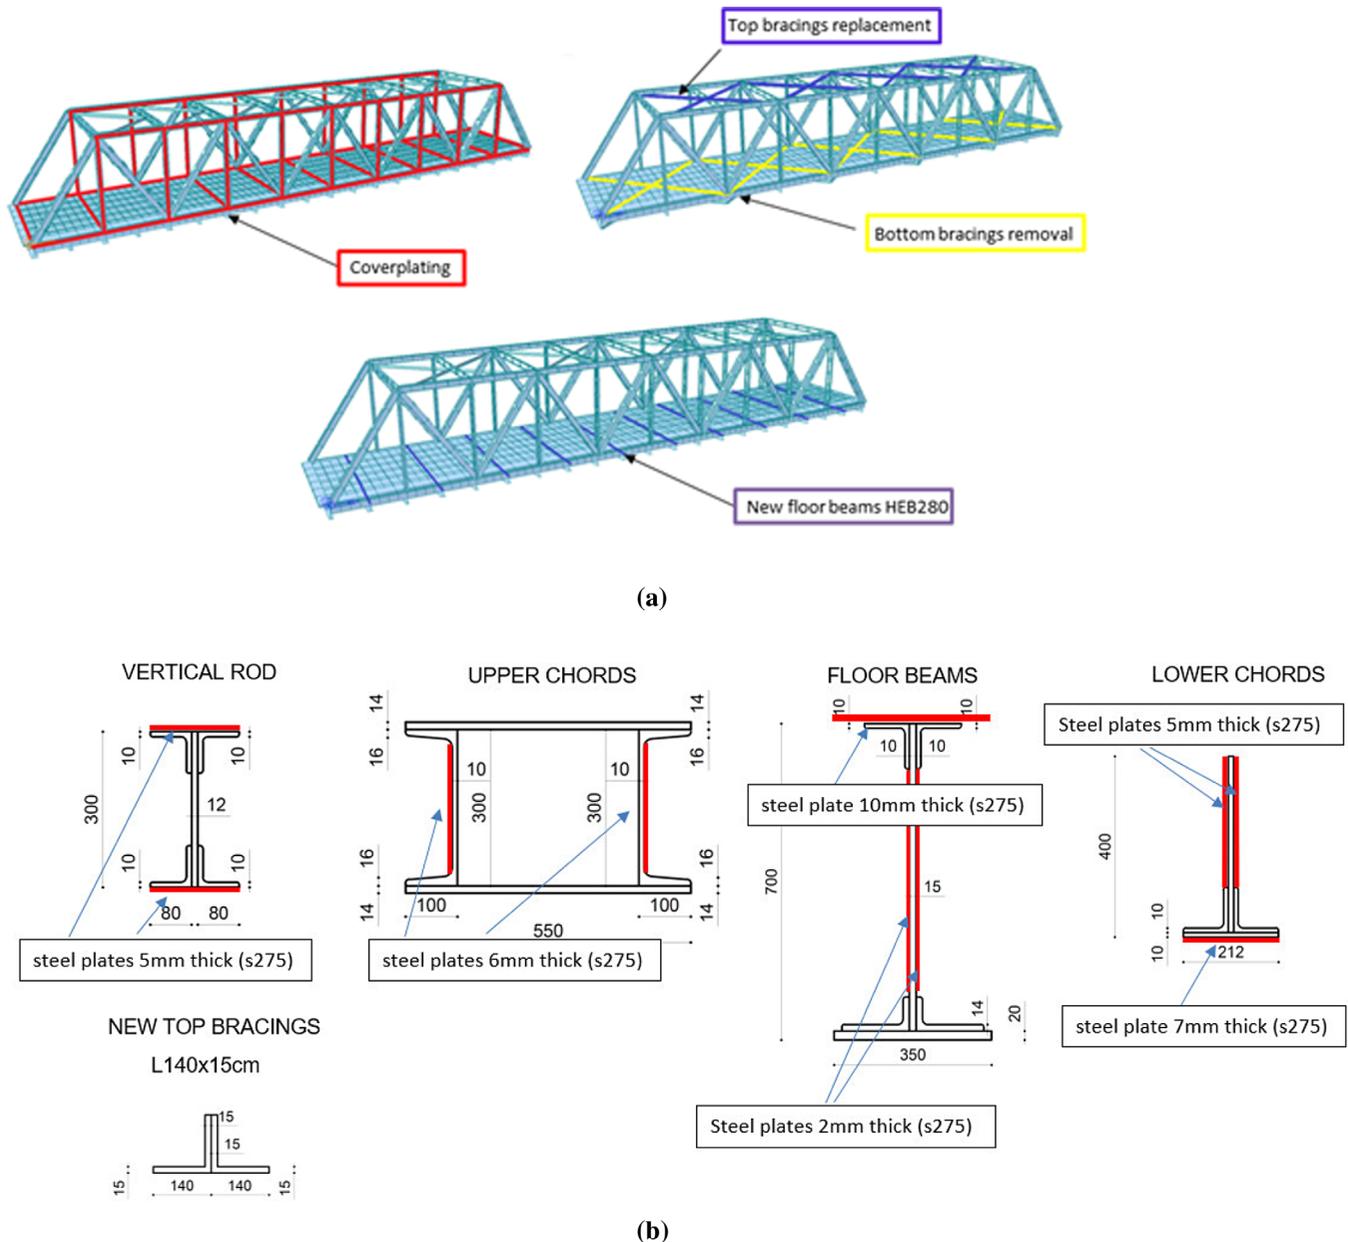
Steel to steel retrofit intervention for the retrofit alternative RRA1-2-l: general description of the interventions (a); cover-plating and replaced new members (b).
